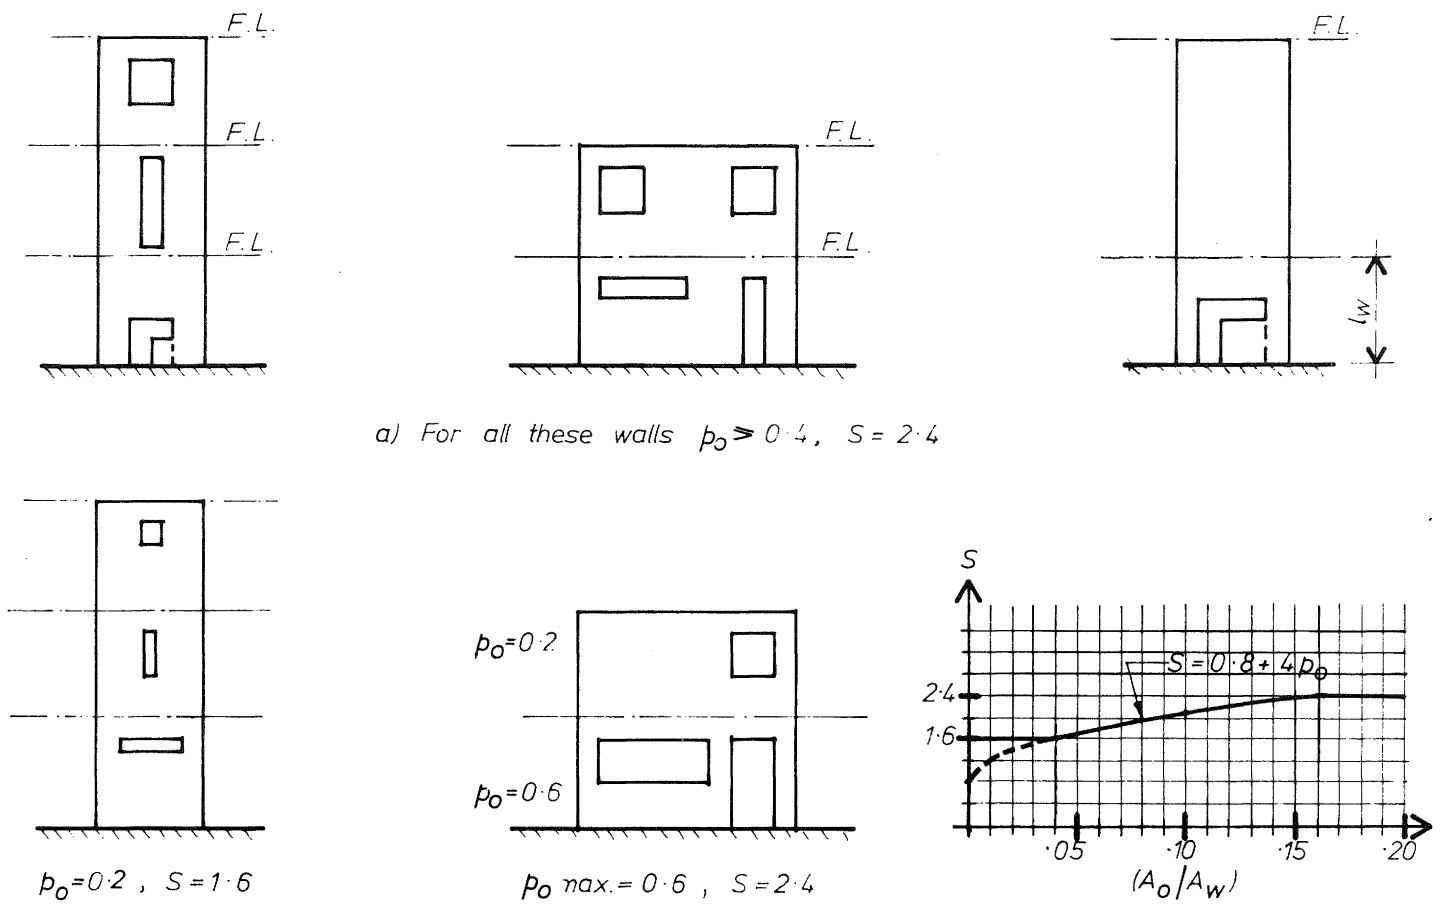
PROPOSED STRUCTURAL TYPE FACTOR  $S$  FOR WALLS WITH OPENINGS
